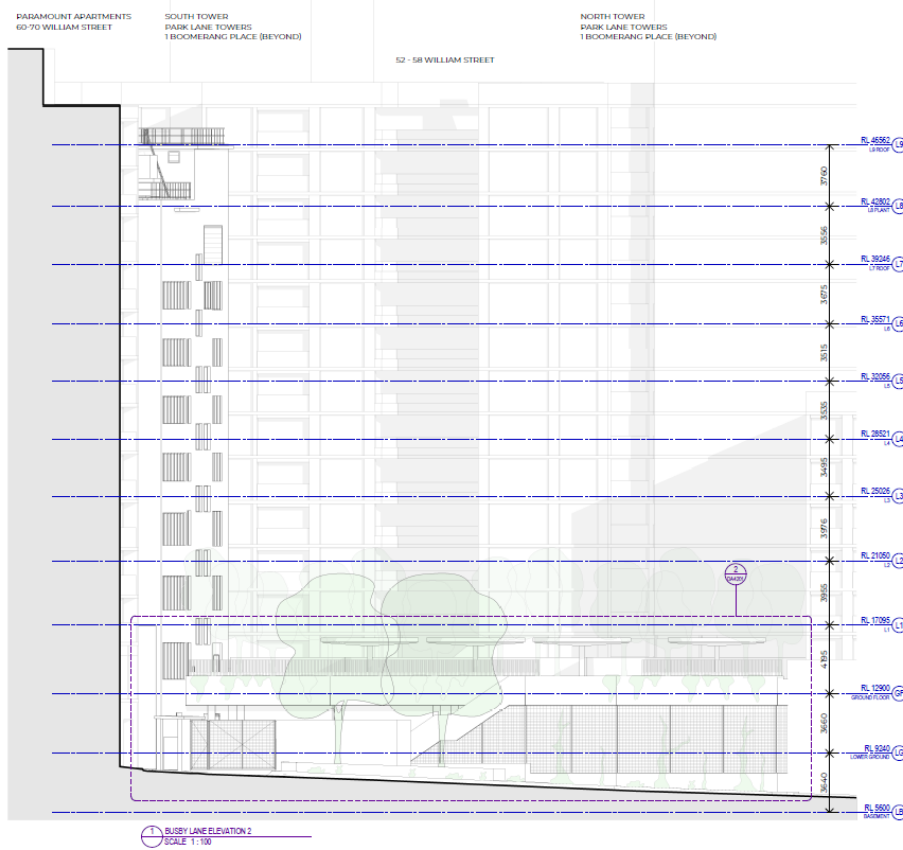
Proposed Busby Lane elevation of raised outdoor space
